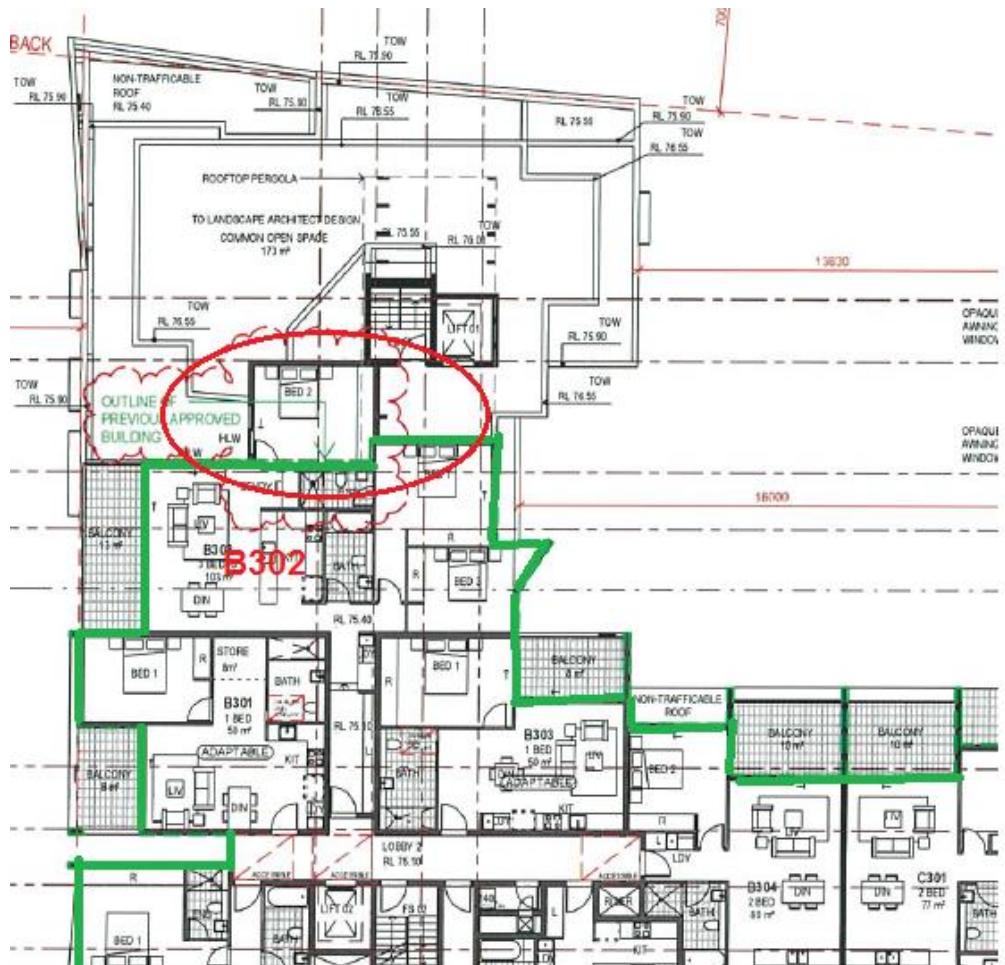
Level 3 with extension of B302 to provide an additional bedroom.
